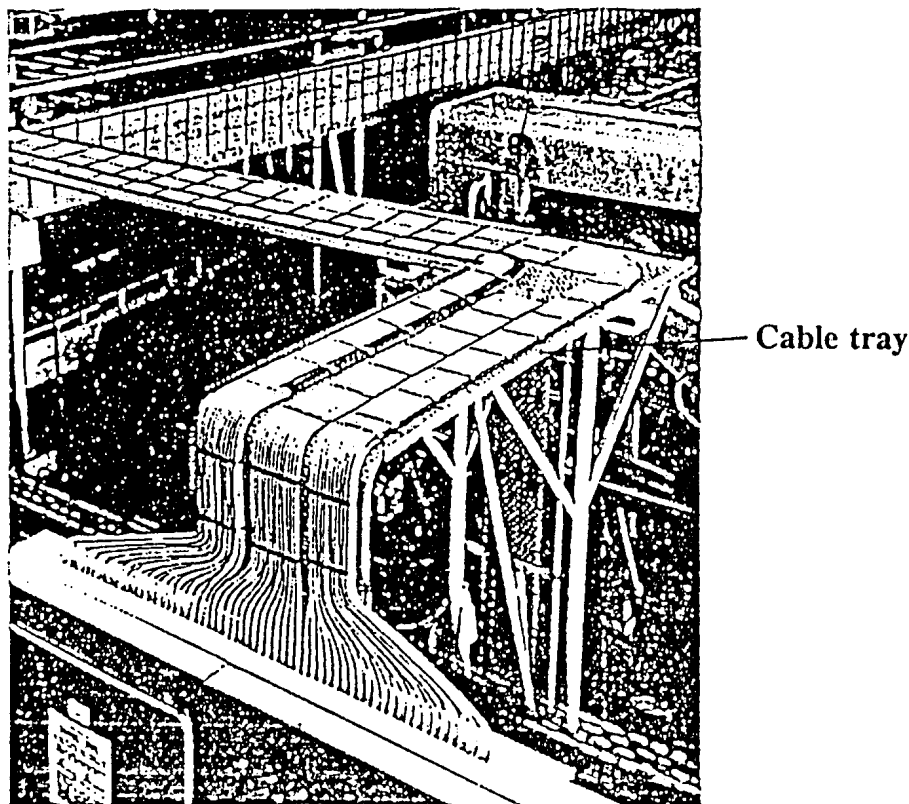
Mineral-insulated Cables run on Cable Tray
